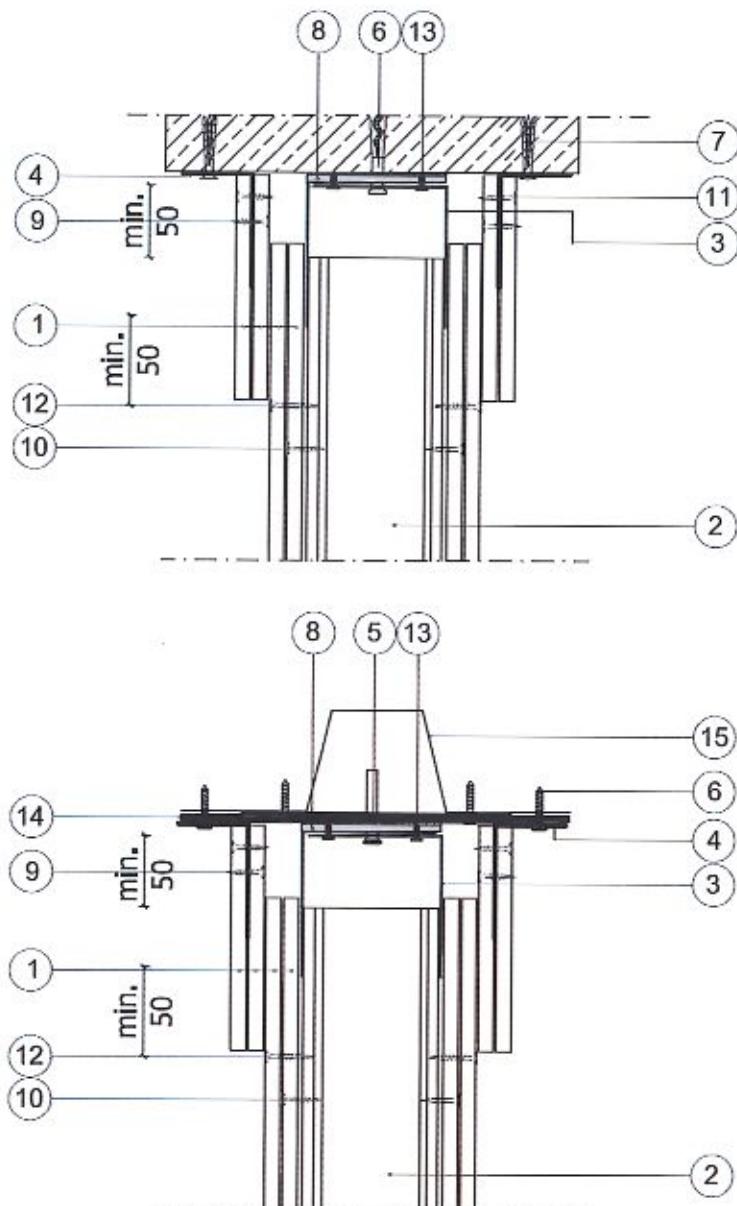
Vertical section. Telescopic connection of the wall, for the deflection of the roof up to 50 mm and the roof cladding not propagating fire
